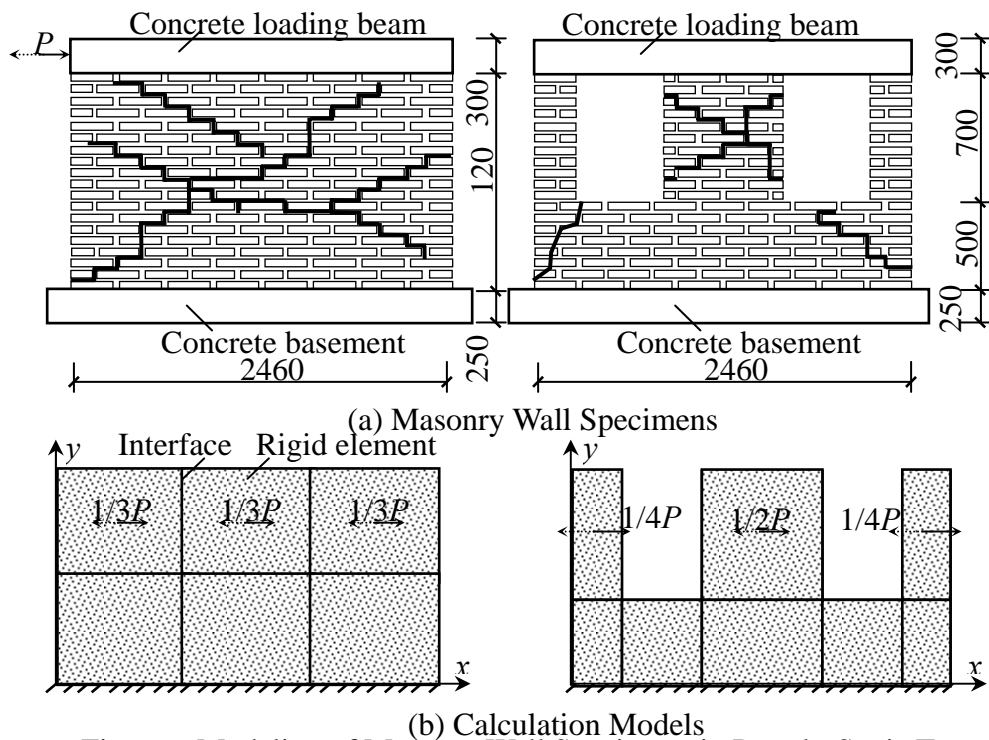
Modeling of Masonry Wall Specimens in Pseudo-Static Tests
